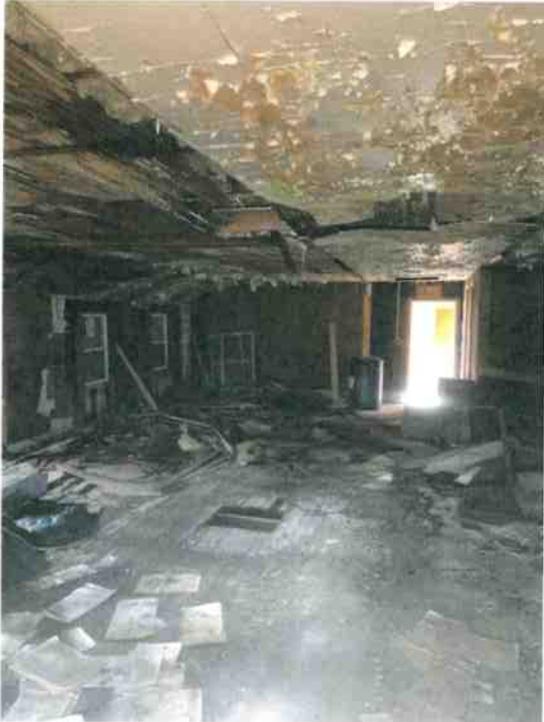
2<sup>nd</sup> Floor of the Motel facing North
